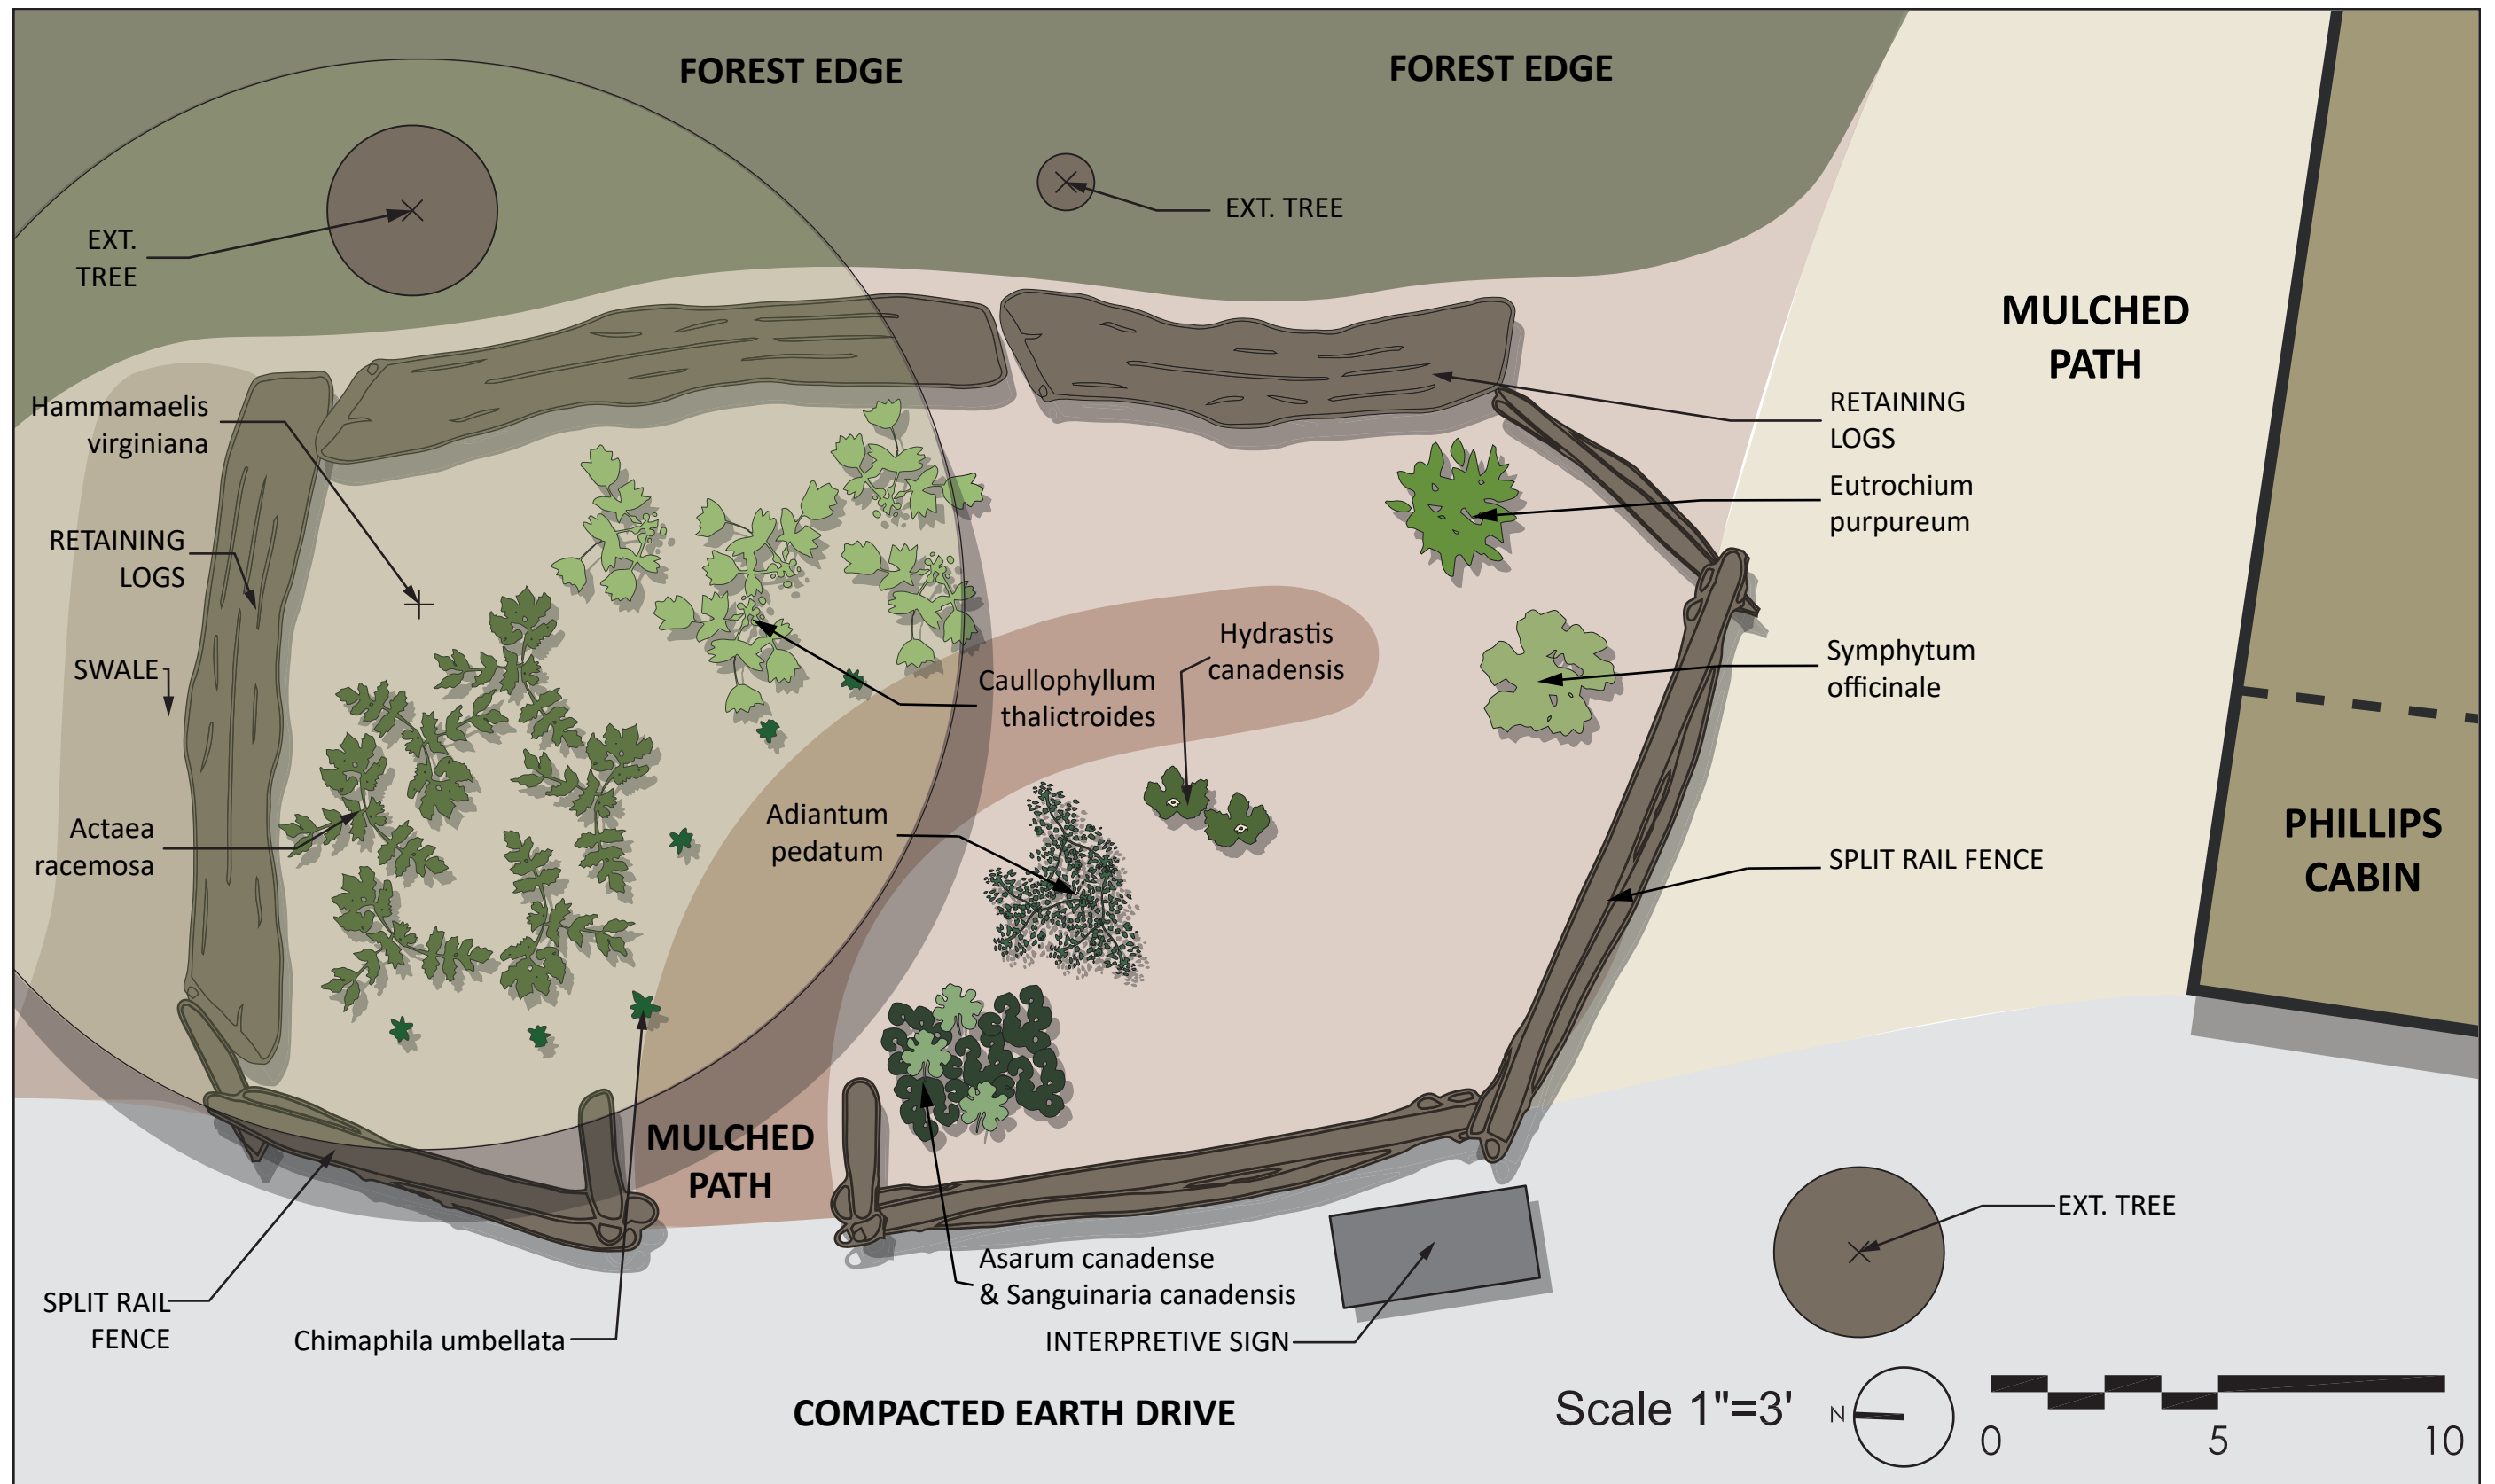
As-Built Planting Plan Plot 1 (Image by author)
